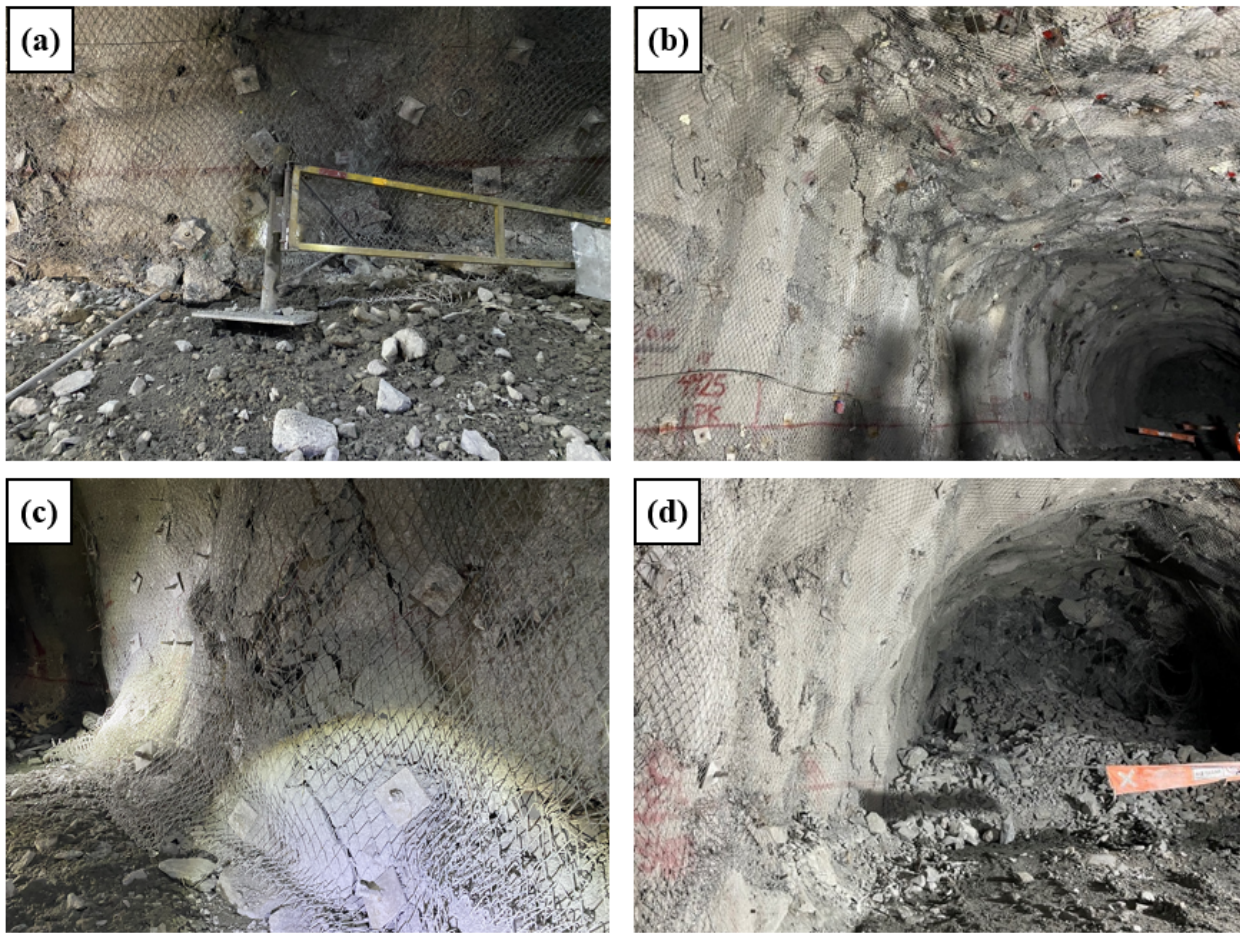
Ground inspection after seismic events; (a) Floor rise; (b) Slight bulging of north shoulder; (c) Slight bulging of south wall; (d) North wall cracking
